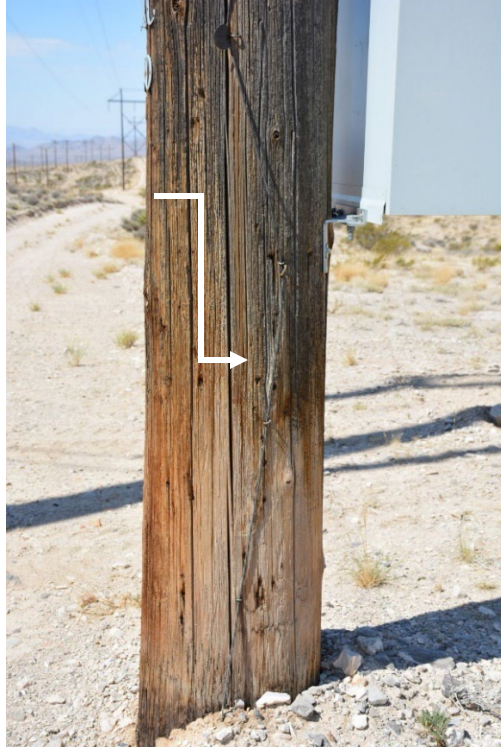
H-frame structure, detail of ground wire placed vertically along length of pole, facing southwest.
